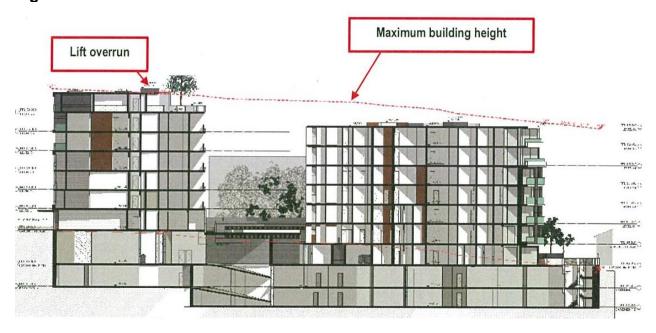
Section illustrating the maximum building height allowed across the site and the lift overrun non-compliance in Building A.
